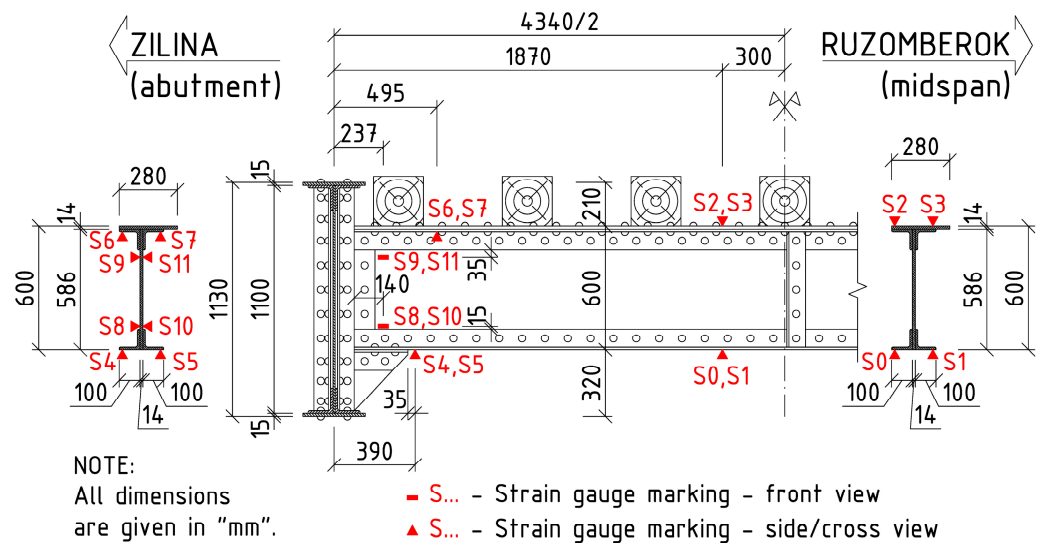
Configuration of the chosen stringer-to-cross-girder connection and placement of strain gauges.
